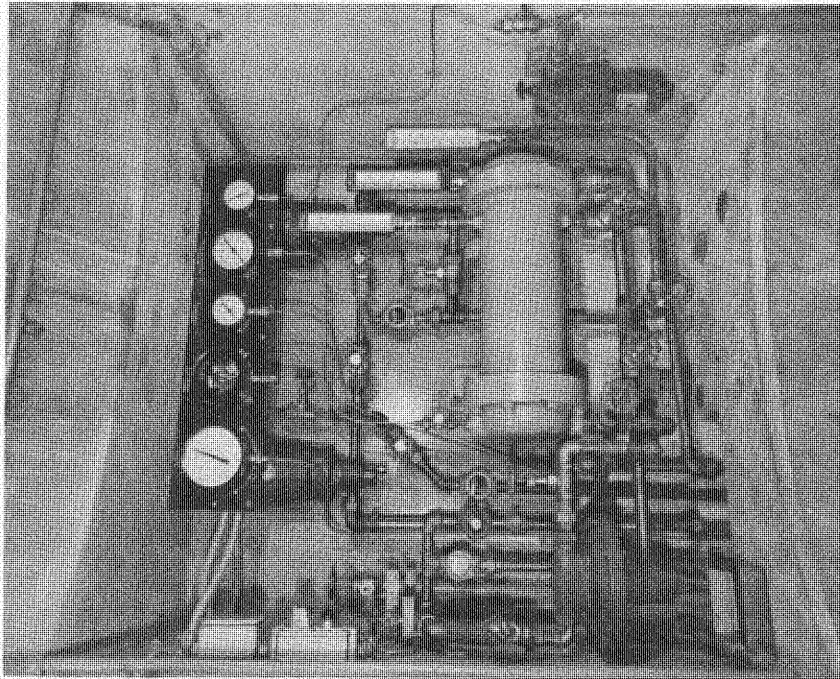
Interior view of unit 2 turbine pit showing turbine lubricating oil cooler, pump, gage panel and related piping. P783-908-1790, May 5, 1955.
